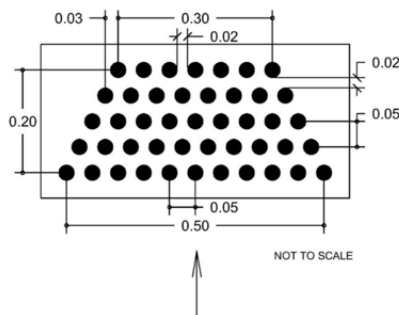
Plan of Oyster Reef Pile Structure Trapezoidal Pattern –
